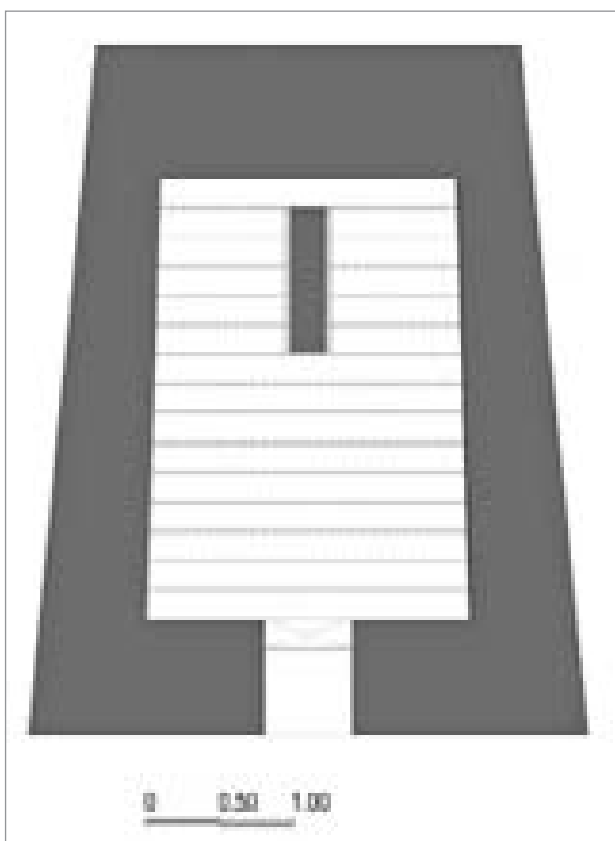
Plan of the kiln (drawing: S. Angelopoulou).
